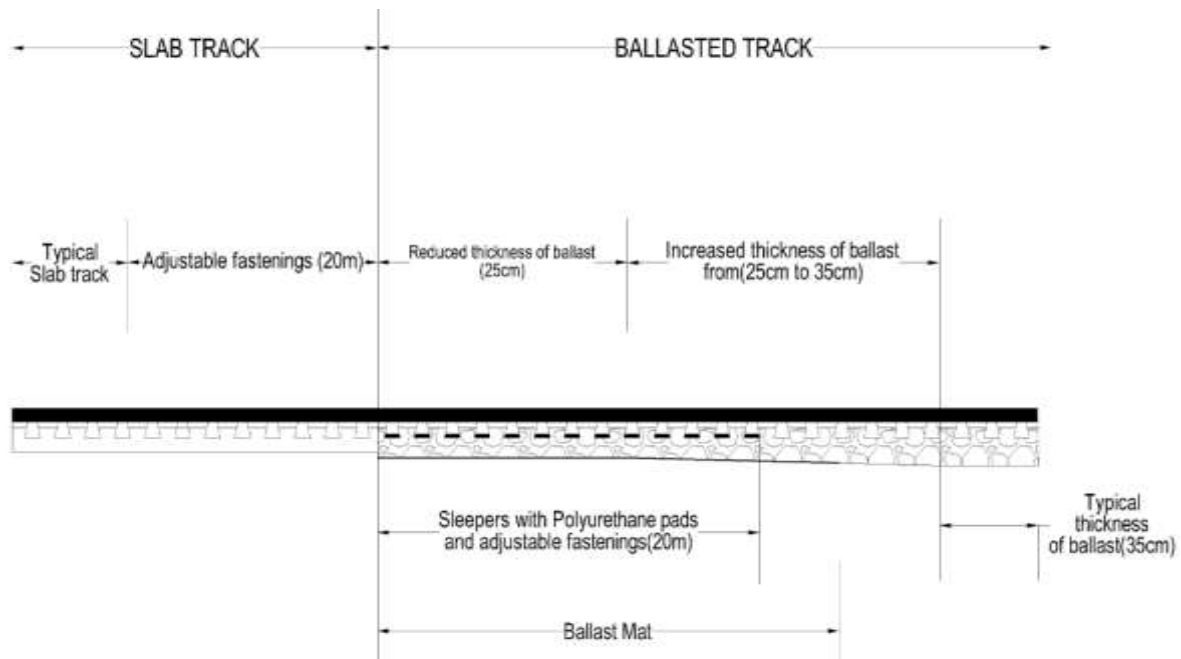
Details of Ballast Transition from ballast less track to ballasted track (Tunnel to Cutting)
